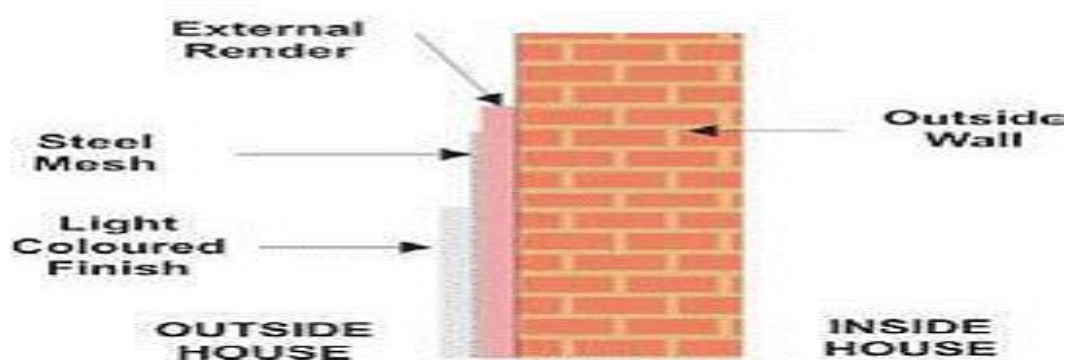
Insulation material on outer side of brick wall (Source :Thermopore)
